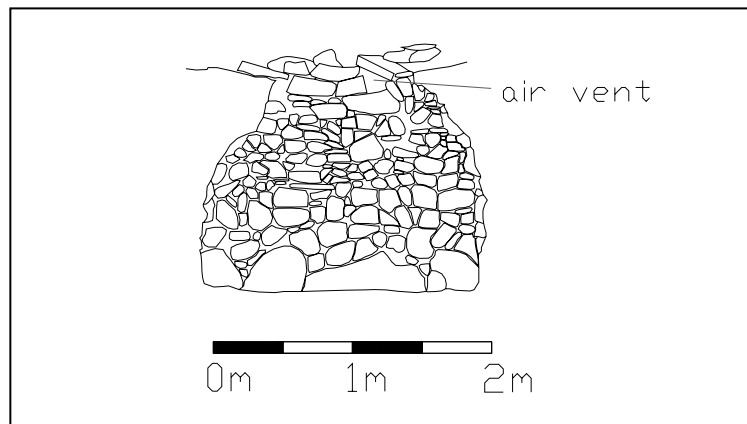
Wall I elevation, north/end wall of gallery 4 (Grid Point solutions with additions)
